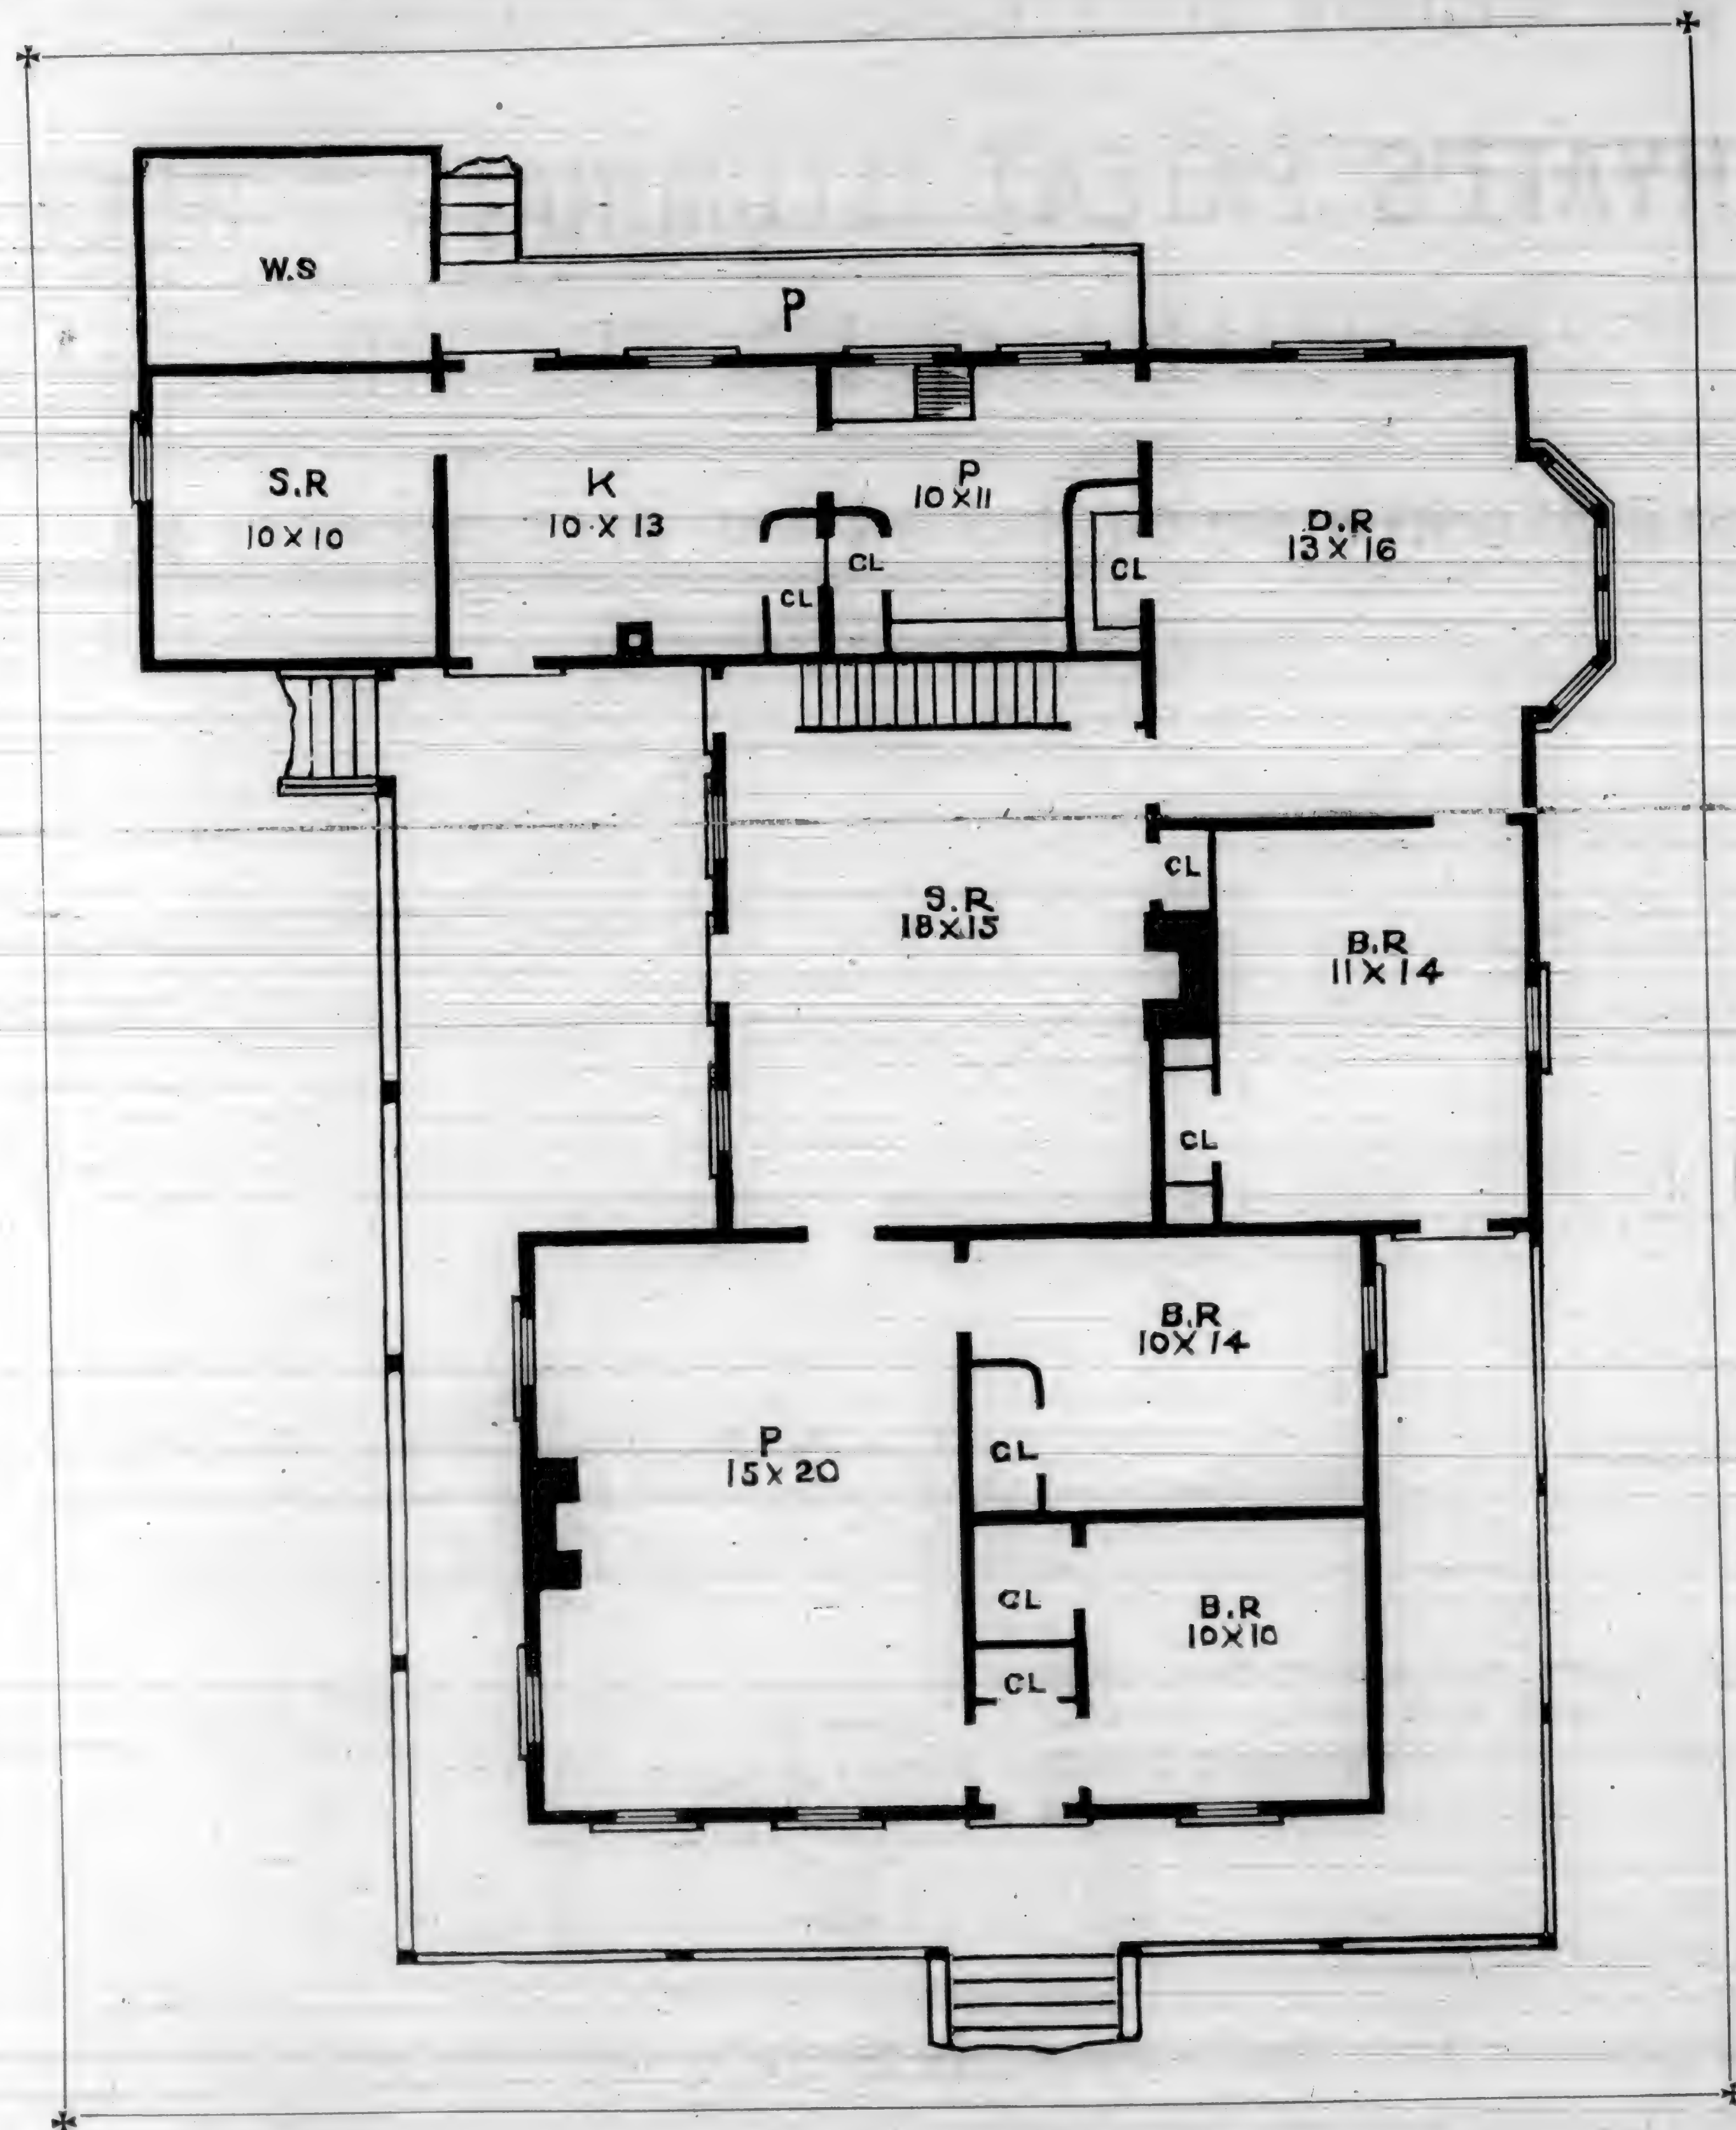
GROUND PLAN OF COUNTRY DWELLING.
